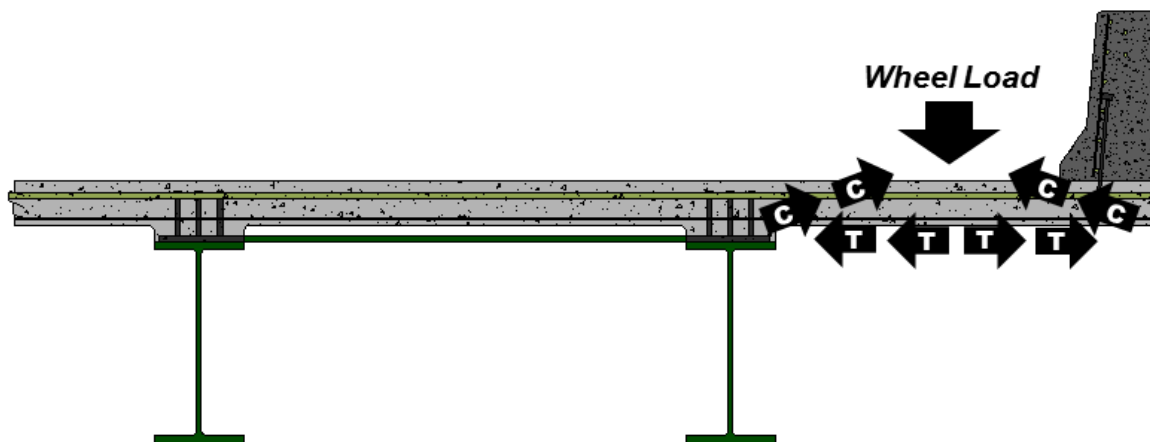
Hypothesis of arching-action behavior present in cantilever slab overhangs subjected to a wheel load
